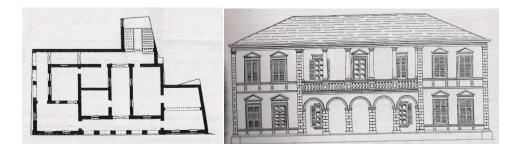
Plan and Elevation of Post Office and Land Registry Office Building, Nicosia (Schaar *et all*, 1995)
